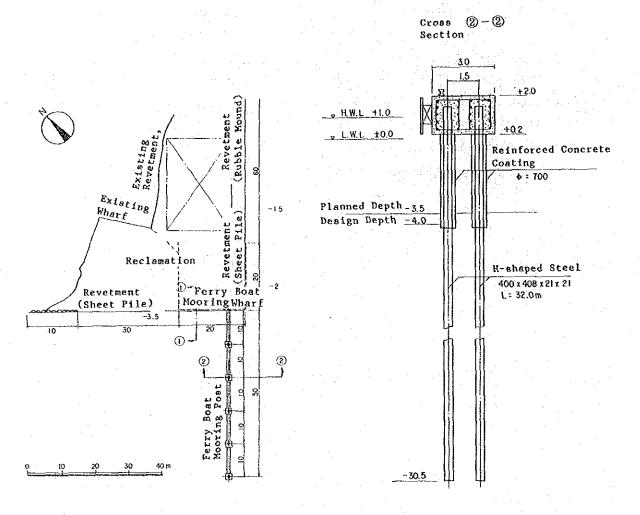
Layout of Ferry Boat Mooring Facilities
